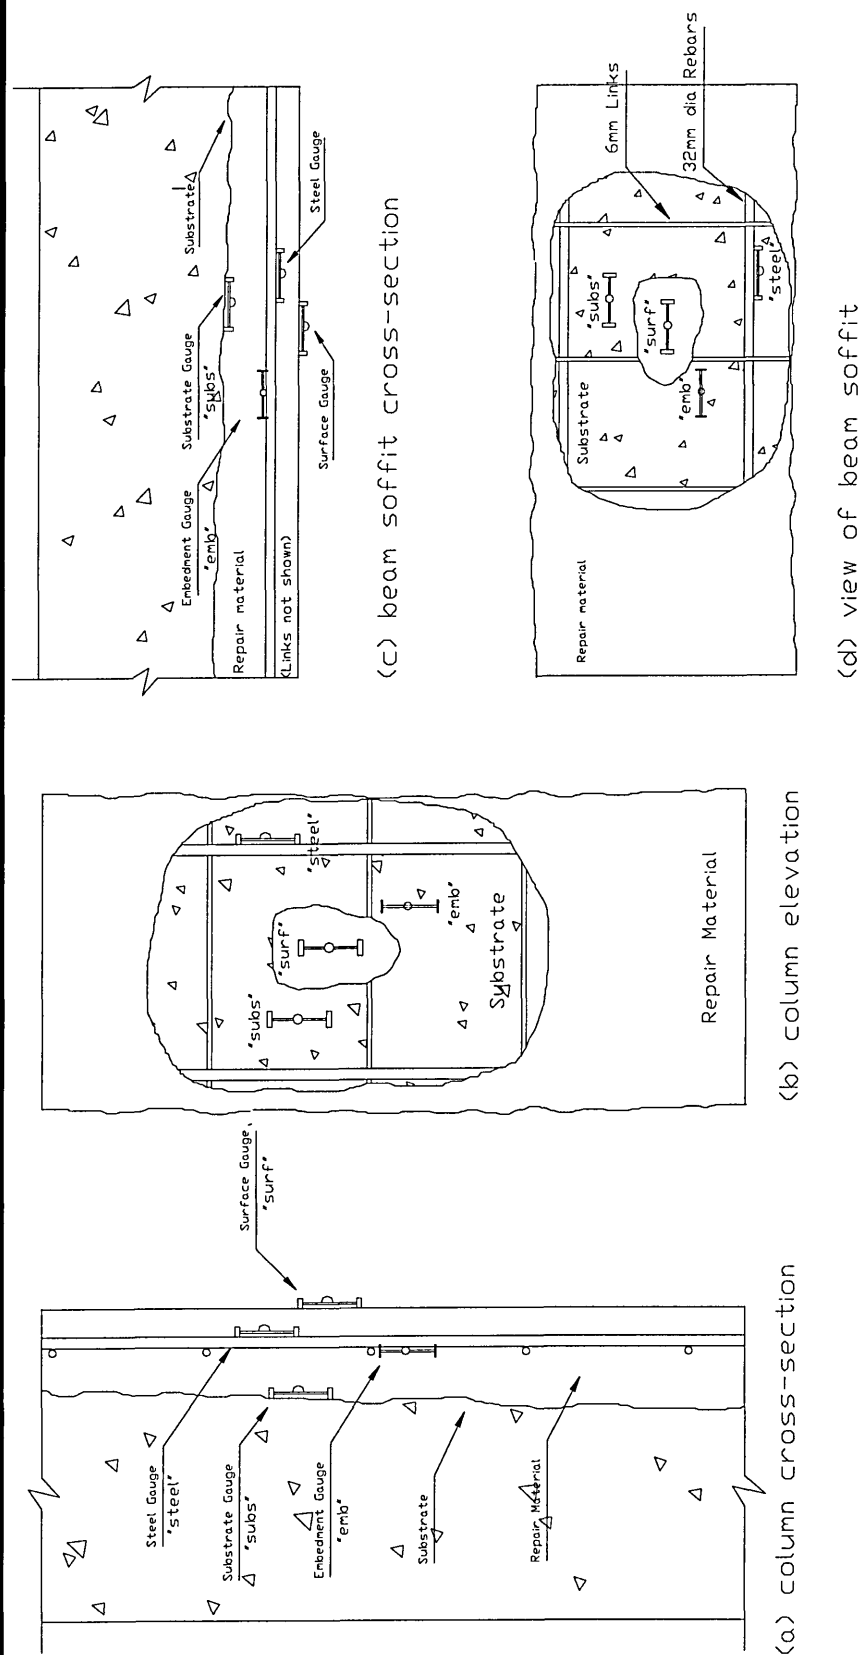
Position of gauges in the repair patches on the beams and columns at Sutherland Street Bridge
